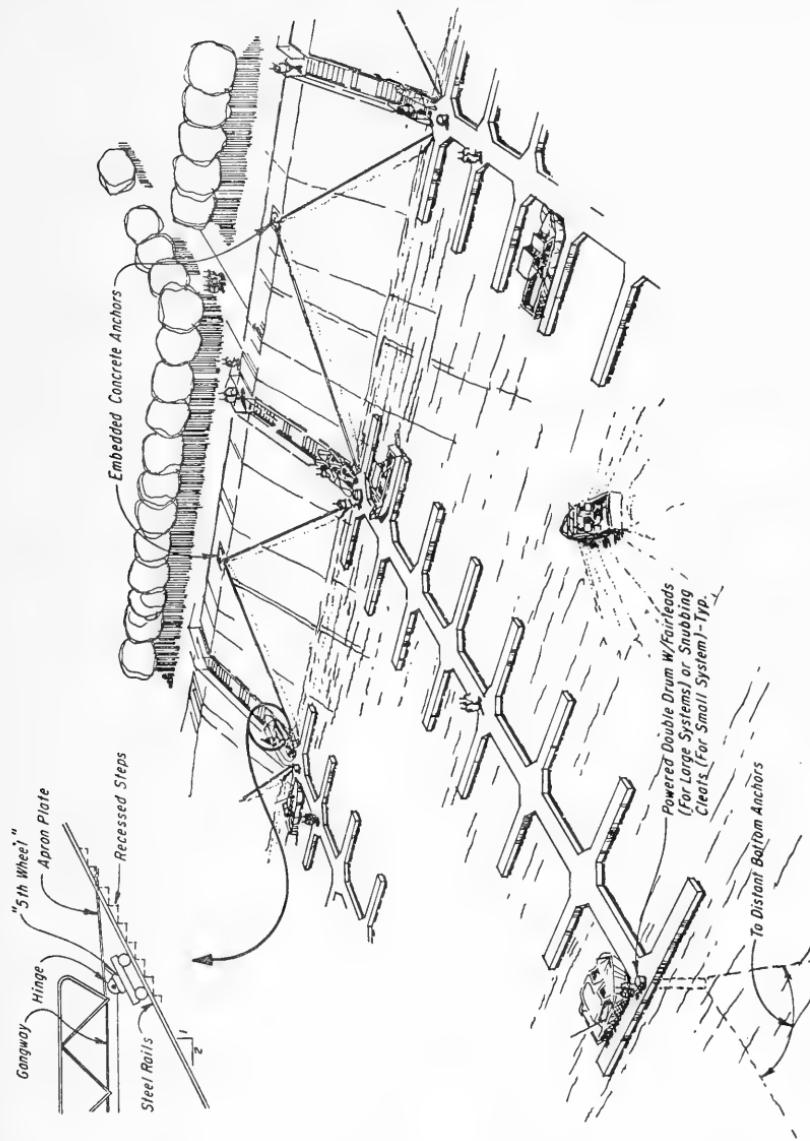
Deepwater anchorage of floating pier with drawdown adjustment. Schematic is but one method of drawdown adjustable anchorage; each situation requires special engineering and detailing.
